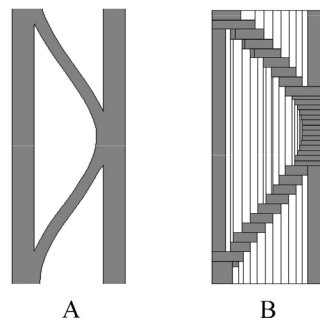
The standard 3DCP wall 3DCP section (A) and The modified 3DCP wall section geometry in WUFI (B)
